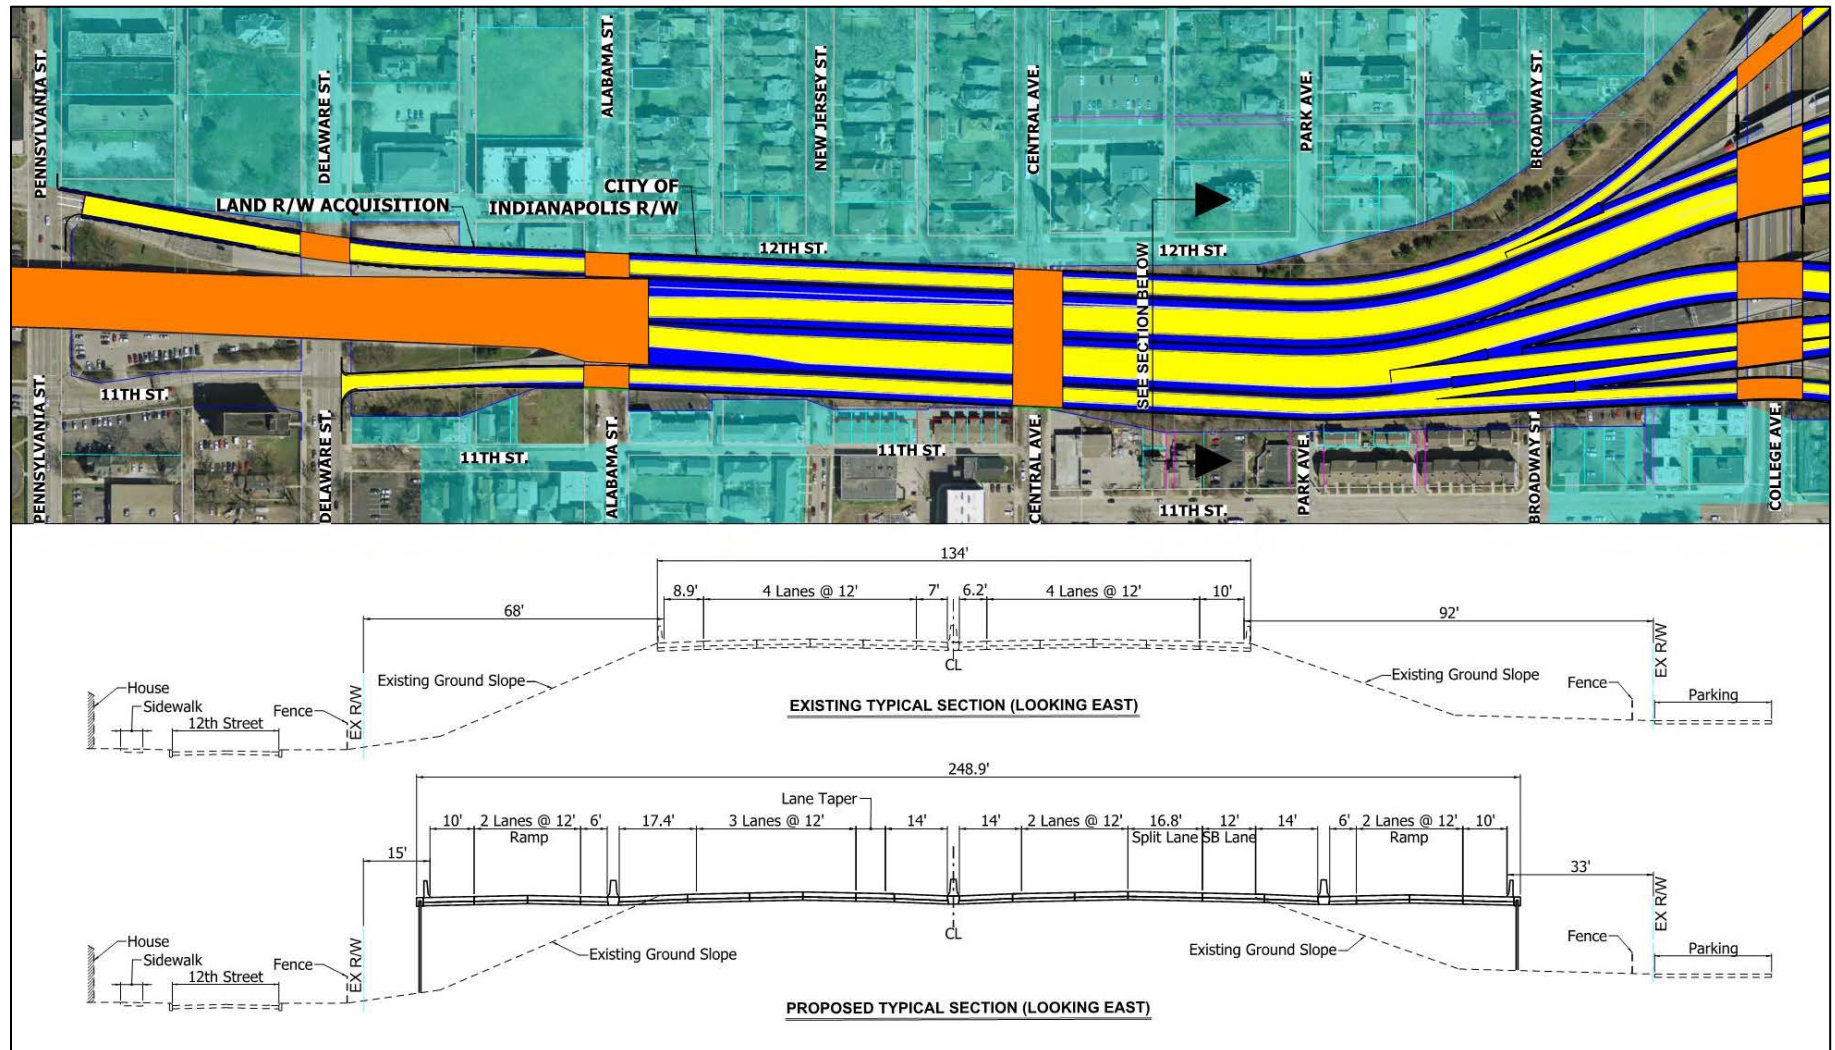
Alternative 5 - Cross Section at Central Avenue
